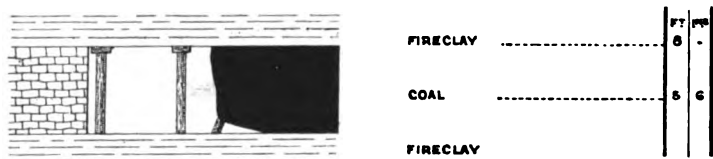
FLORENCE COLLIERY, LONGTON, NORTH STAFFORDSHIRE. MODE OF PROPPING AND SPRAGGING AT THE WORKING FACE ON THE GREAT ROW SEAM.
